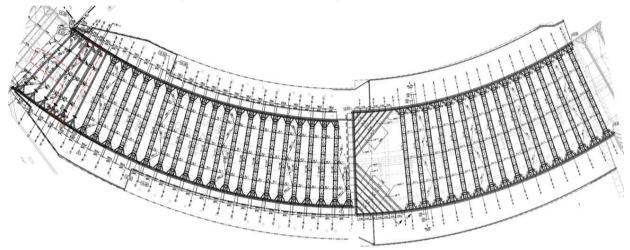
UWT Stage 1 and 2 Mega Truss Layout Plan
